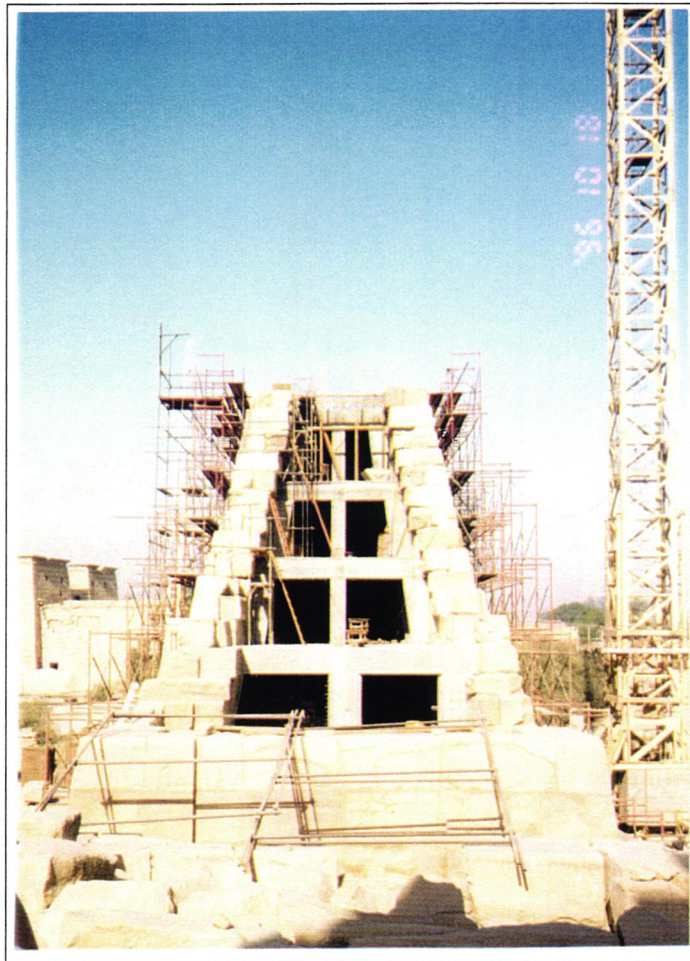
Location "F" and "G" East Main Enclosure Wall Interior View
